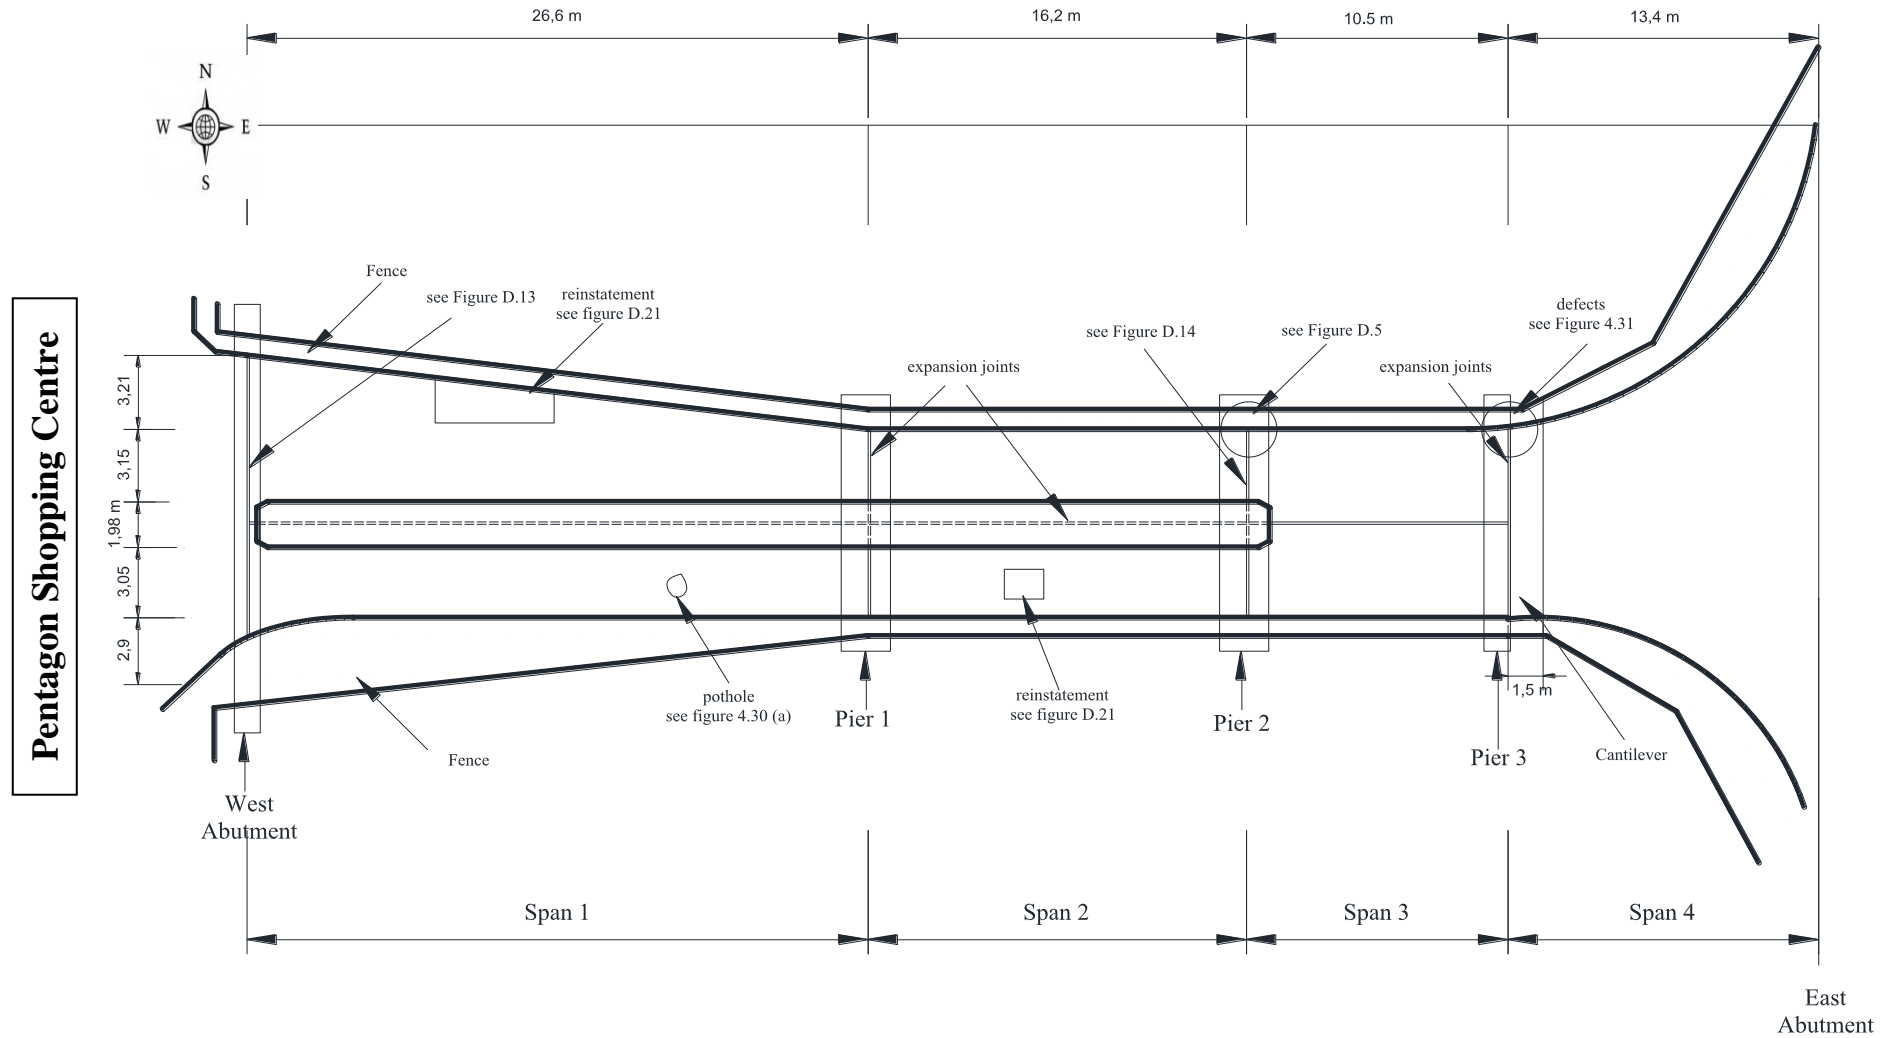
Pentagon Road Bridge plan view (see Figure D.4)
